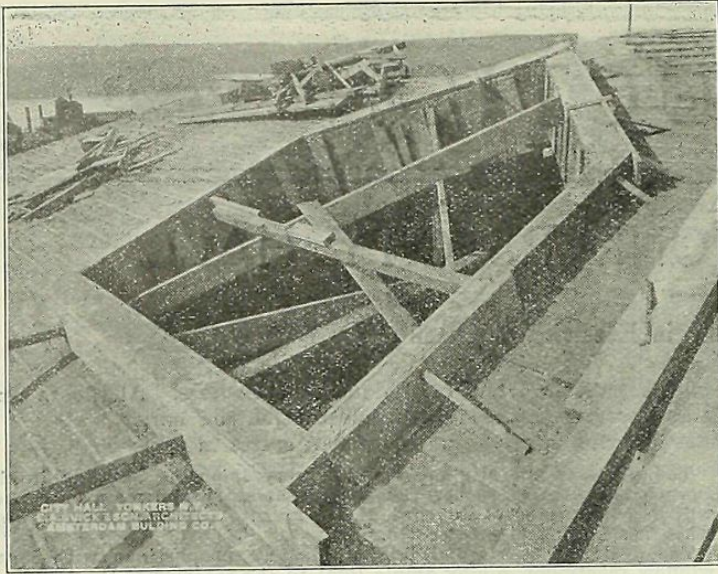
CONCRETE FINISH WITH STRIPS EMBEDDED.
